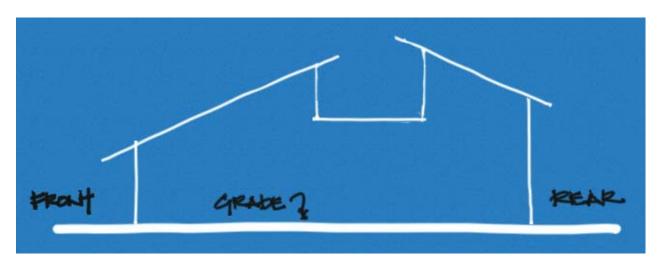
The resulting building shape reflecting the massing omission noted in Image 3, and when removed, demonstrates the use of 'Shed Roofs'. Worthy of note is that the number of roof planes equals that of the 'Gable Roof' form and, the newly defined 'Shed Roof' forms, remain in the same location as those of the 'Gable Roof' form.
